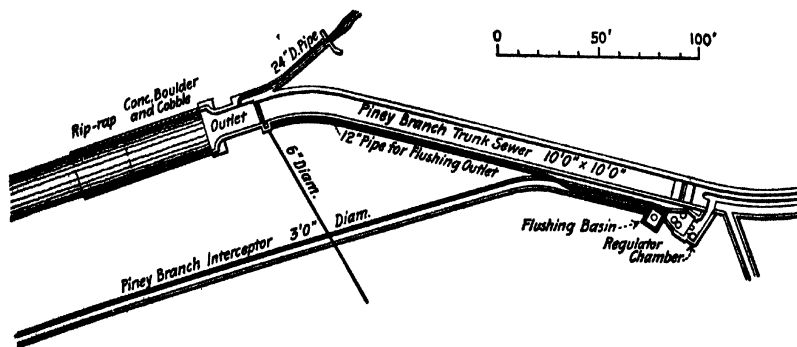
Plan of regulating works, Piney creek sewer, Washington.
